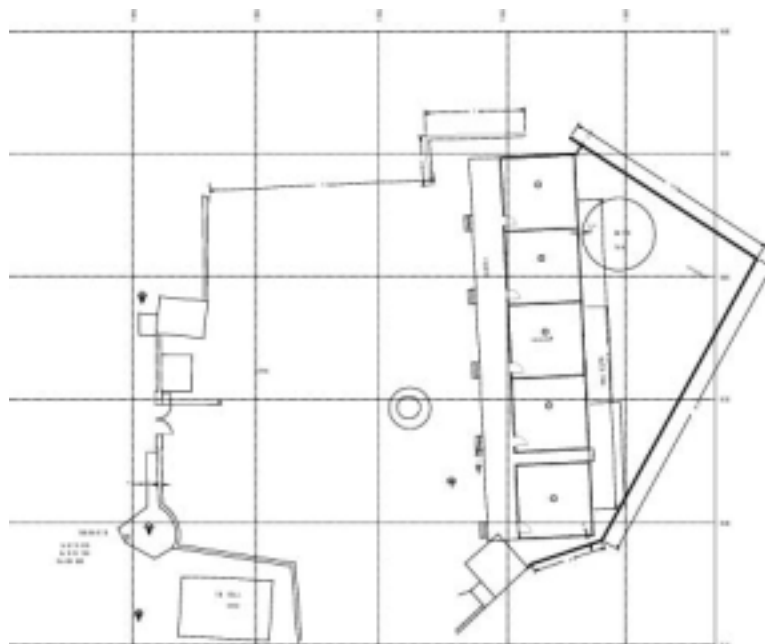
Revised Layout Plan – Sumarasar Sheikh Primary School
